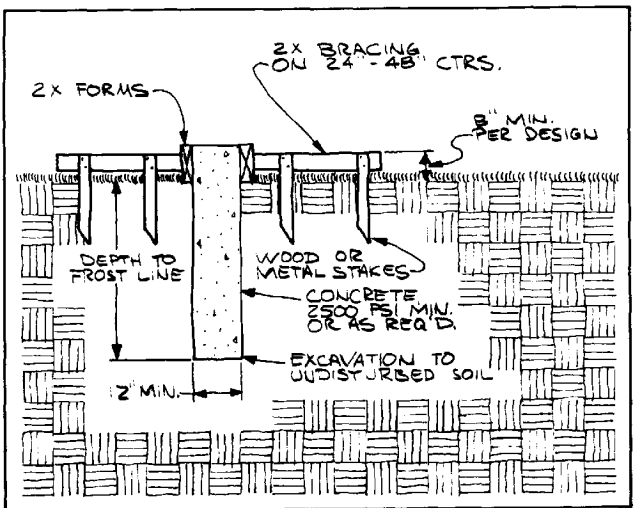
Combined wall/footing. No footing is needed in a crawl space if the soil can support the structure on a 12- to 24-inch wide base. Formwork can be simplified, as shown, if the soil can hold a vertical cut. Or formwork can be eliminated altogether by pouring only to grade and finishing with block.
